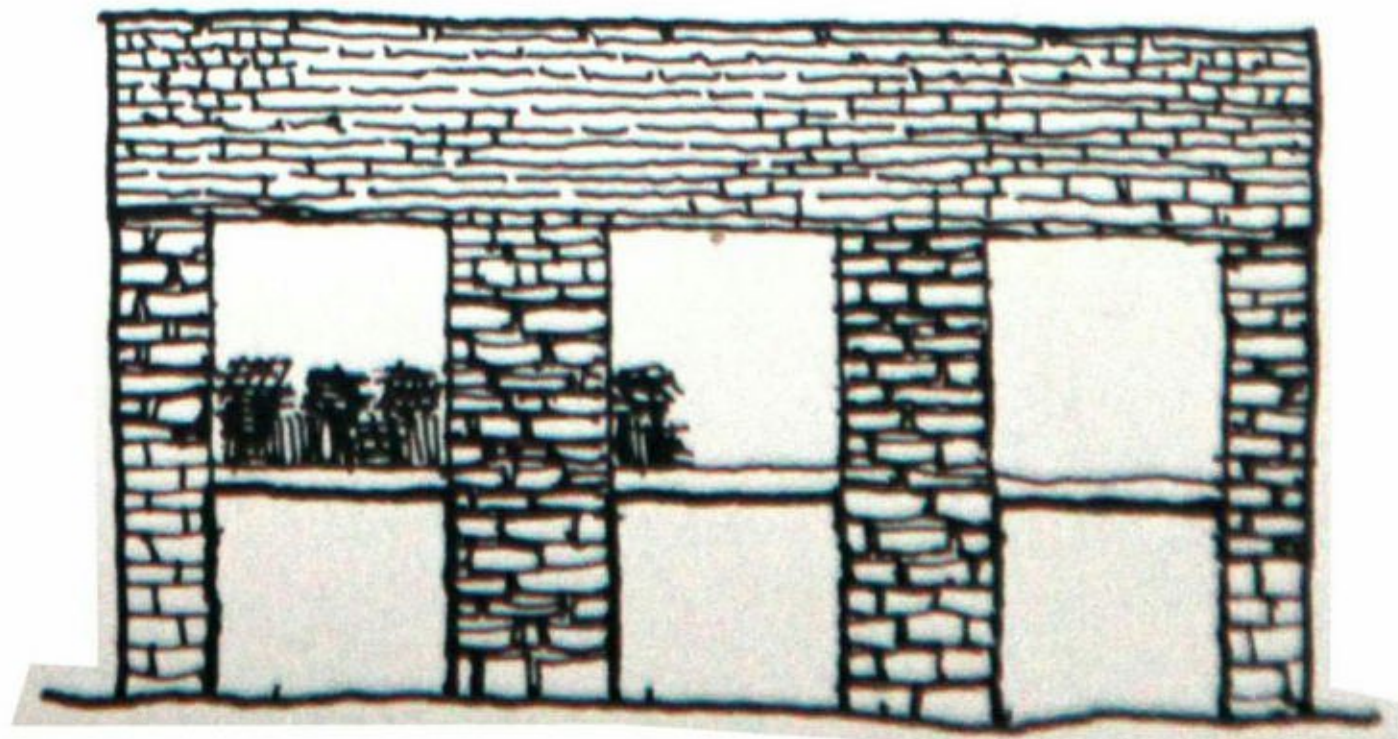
Linhay with stone piers (image ref R.W. Brunskill)
